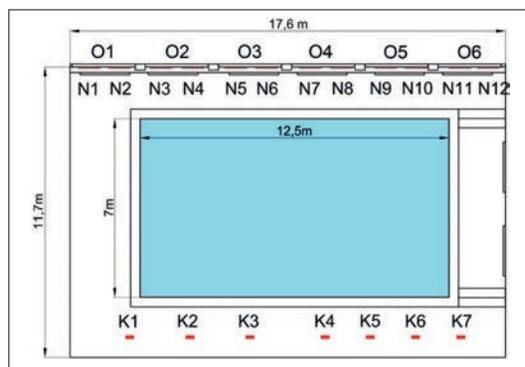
Arrangement of ceiling supply grilles, slot diffusers and windows in the swimming pool [3]
